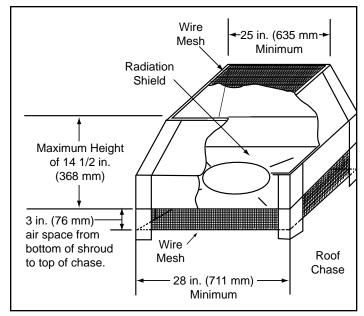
Cutaway View of Shroud with Radiation Shield & Wire Mesh
